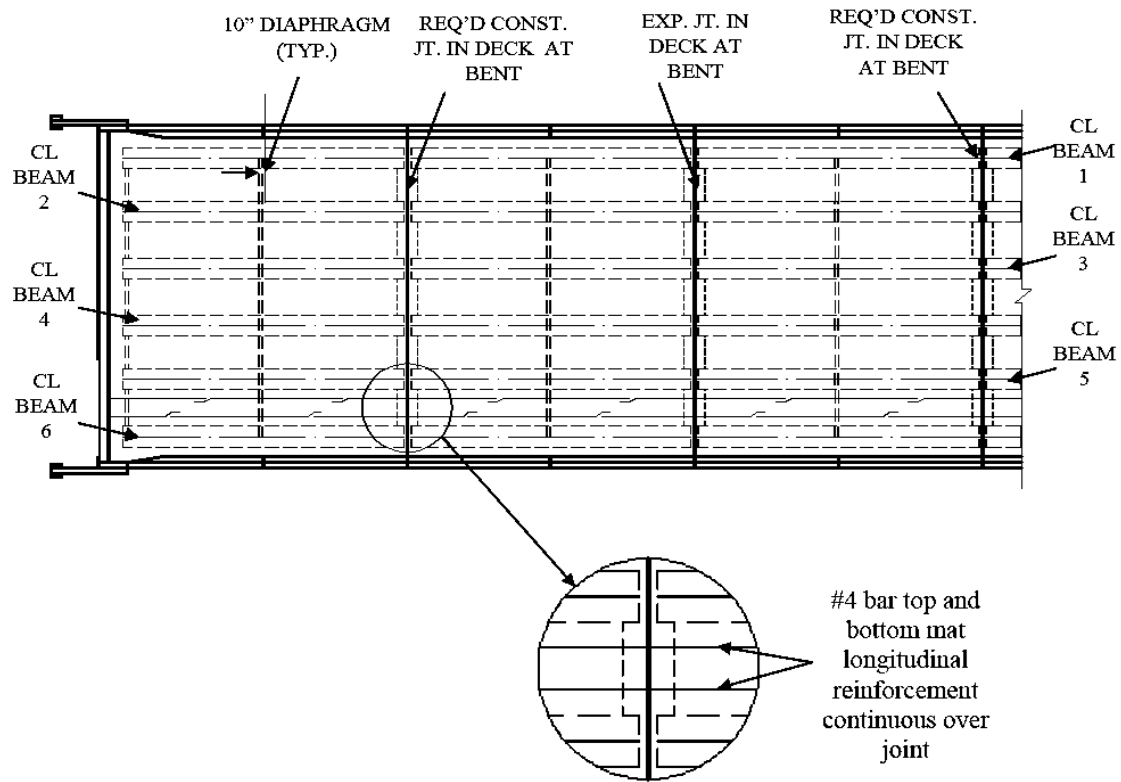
Plan view of modified continuous deck detail (Snedeker et al., 2011)
